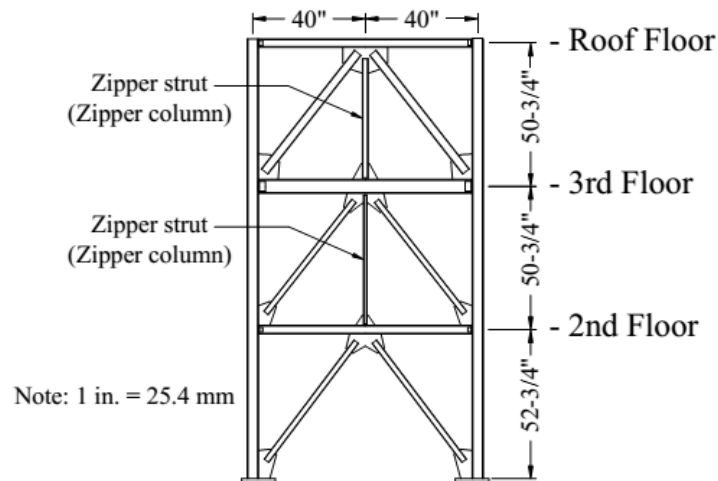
Elevation of the 1/3 scale test frame [1]
